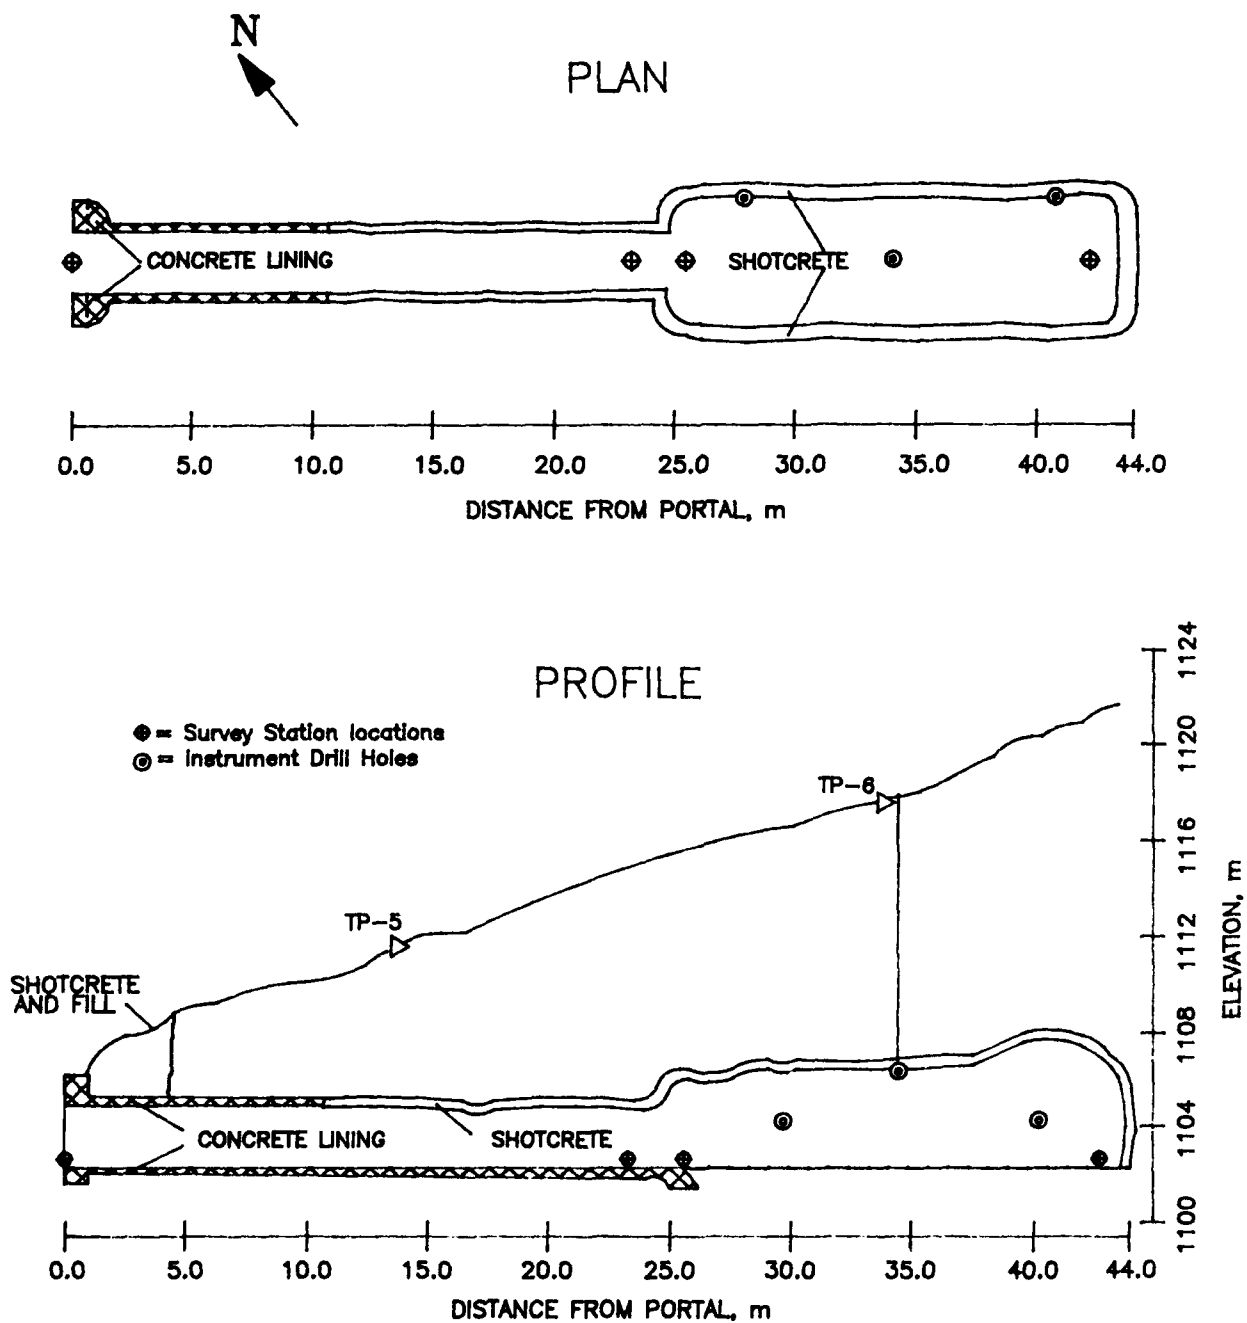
Tunnel/Chamber longitudinal cross-sections (plan and profile).
